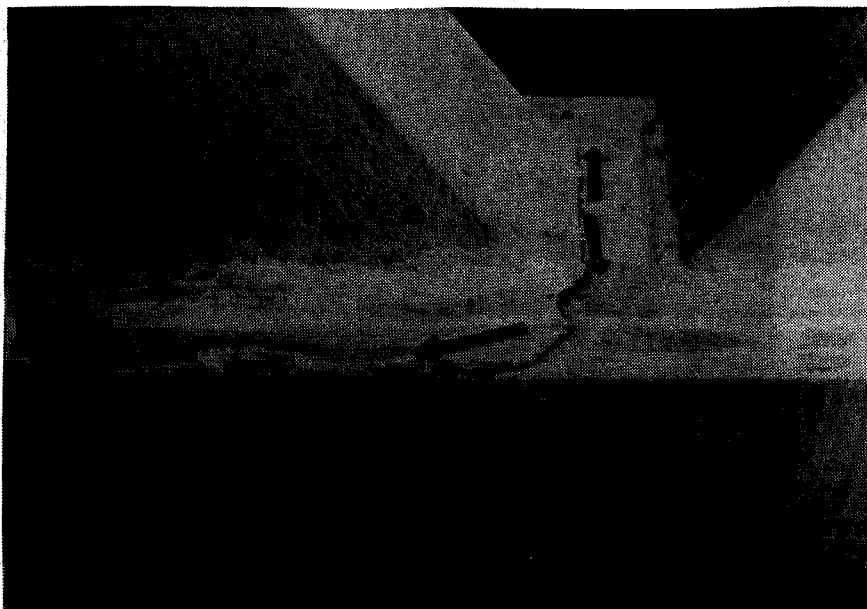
Fatigue Crack in Joint L1 (T10F)
